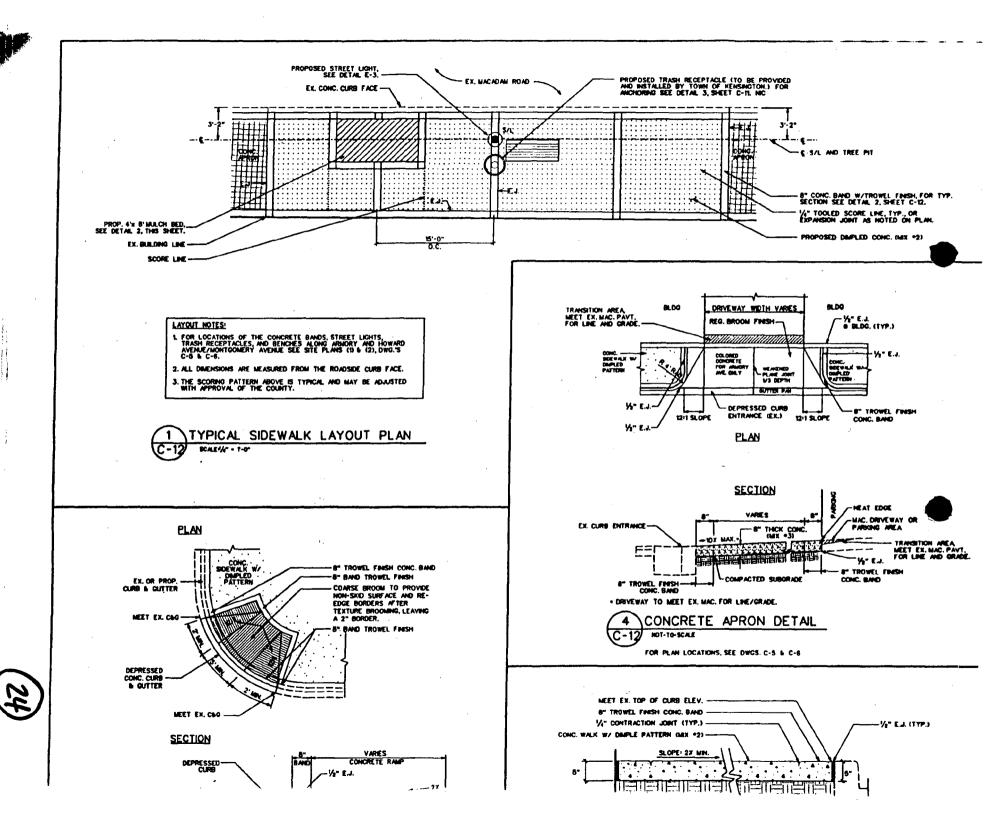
DETAILED PARK LAYOUT AND CONSTRUCTION DOCIMENTS SUBMITTAL
